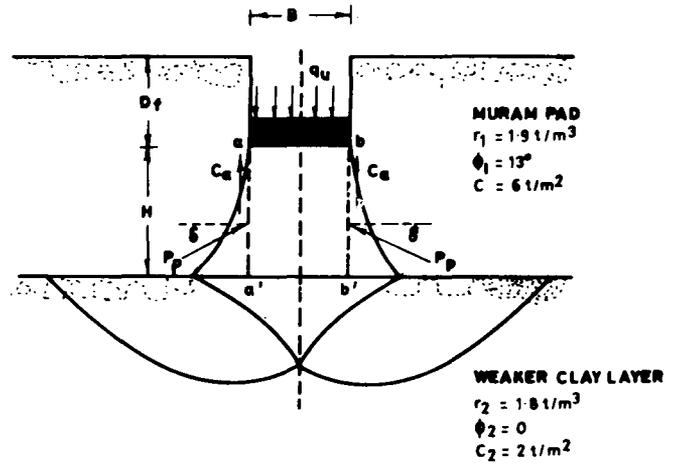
SHALLOW ROUGH COLUMN FOUNDATION ON LAYERED SOIL
